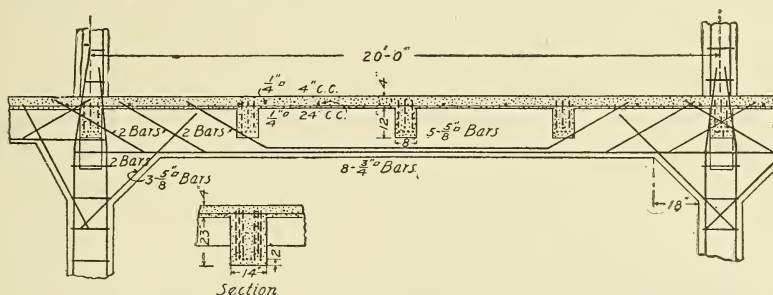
Detail of Girder for Shop Building of Swarthmore (Pa.) College.
